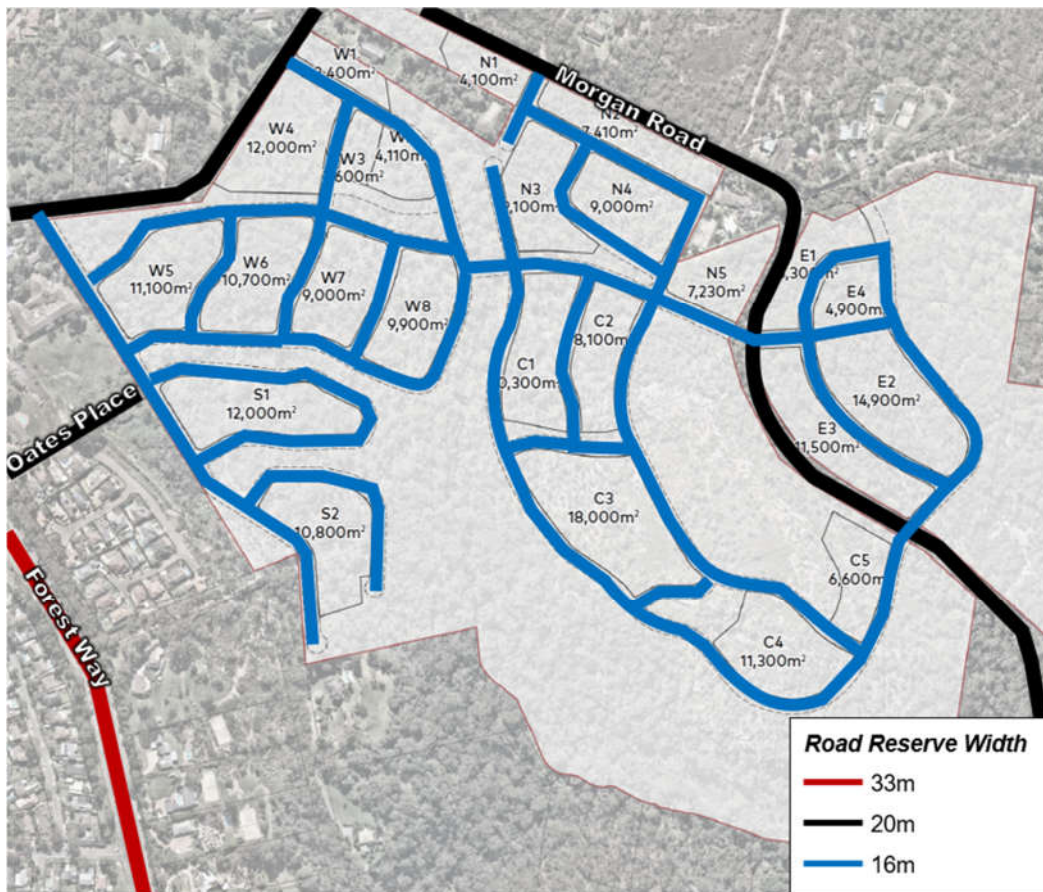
Road widths (JMT Consulting, June 2021)
